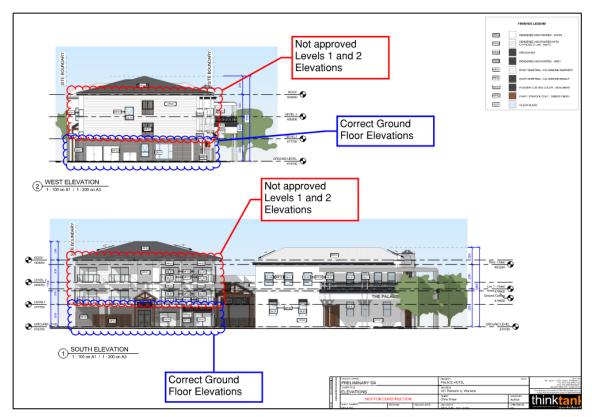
Southern and Western Elevations – Correct Ground Level Elevations (Amended by Council 19 August 2024)
